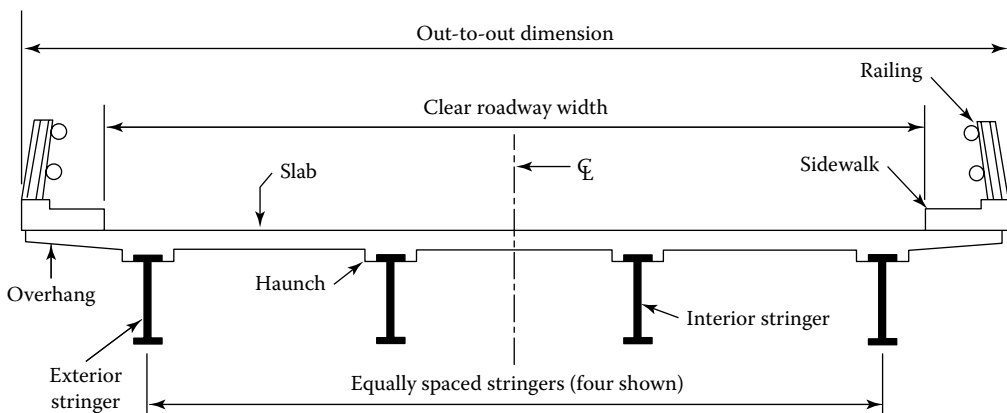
Cross section of a typical slab–steel girder bridge.
